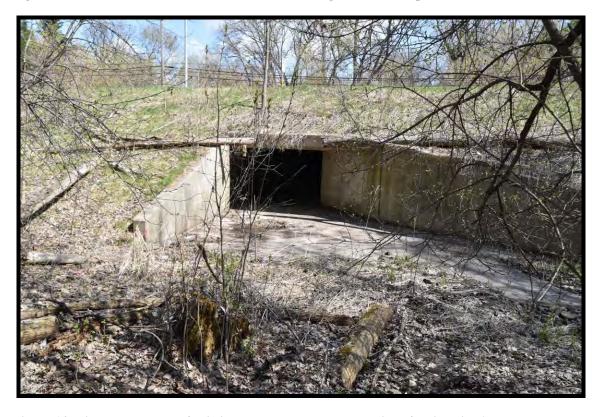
View to northeast of existing culvert on the southern side of University Avenue.
